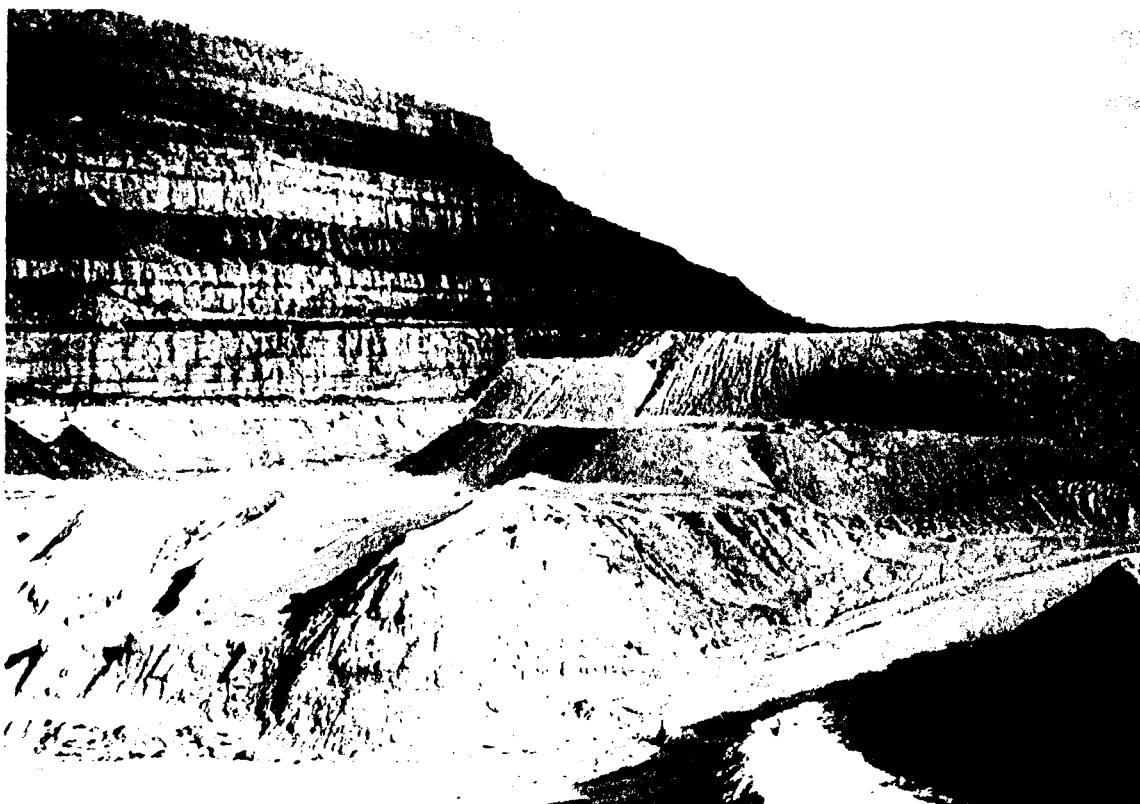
JACKPILE (GAVILAN MESA) PIT HIGHWALL WITH BUTTRESS MATERIAL AT BASE
